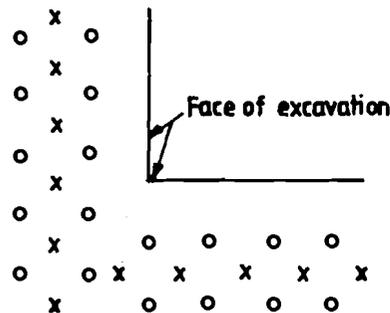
Layout Plan of Grout Injection Holes to Form 'Grout Curtain' Around Excavation. o, Primary Injection Holes; x, Secondary Injection Holes.
